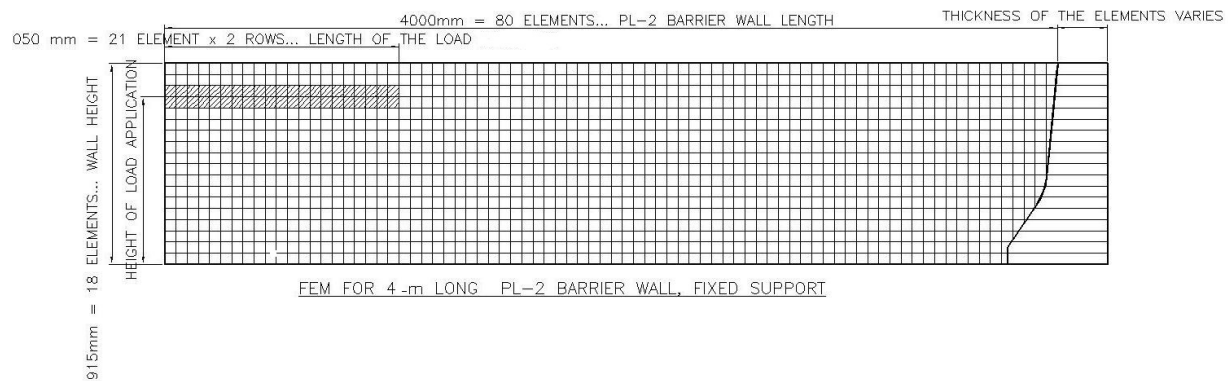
Elevation of PL-2 Barrier wall FE Model
